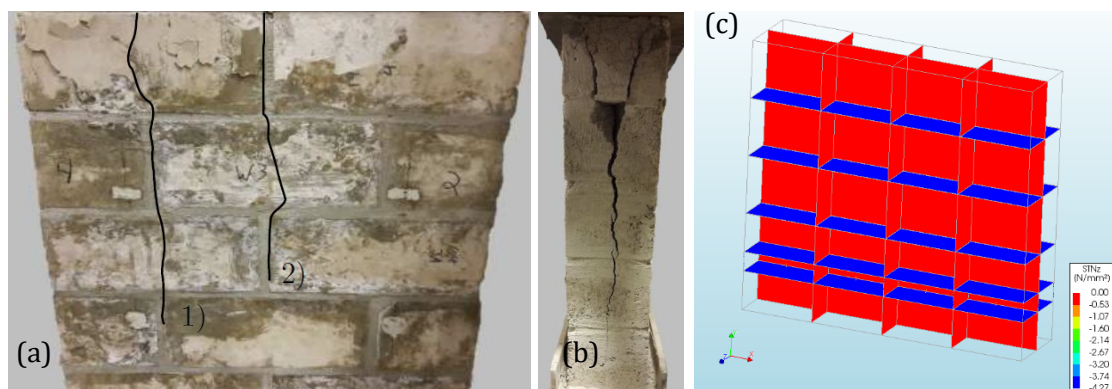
Wallet compression test (a) front face cracks and crushing of top course, (b) head face vertical splitting crack (Fourie, 2017) and (c) numerical model failure mechanism
